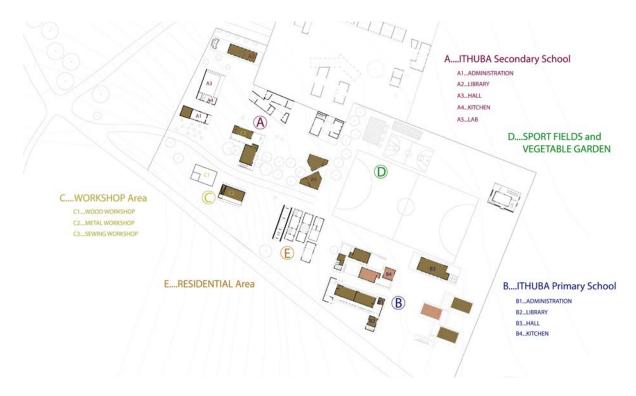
Ithuba Community College, Buildings in light clay construction highlighted
